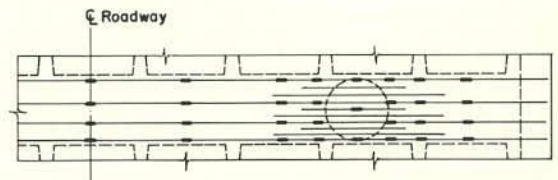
Strain Gages on Top Bent Cap Reinforcement for Double-Column Model Bridge
